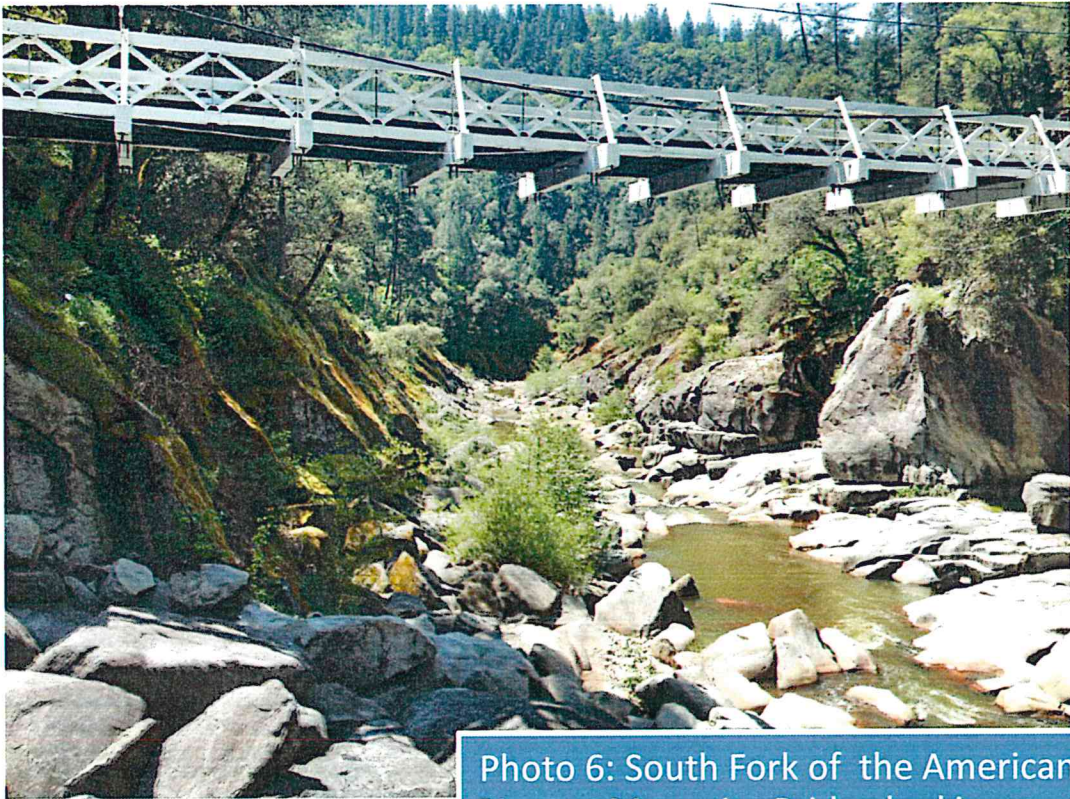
South Fork of the American River at Mosquito Bridge looking east
